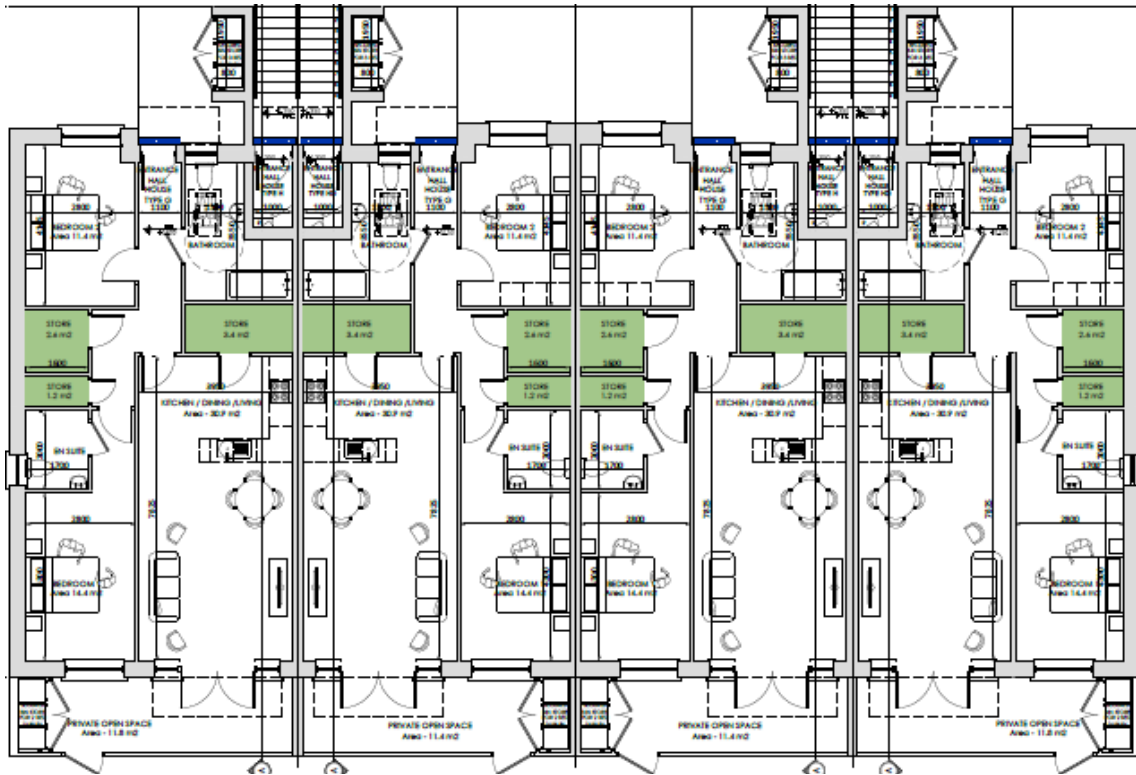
Proposed ground floor plan of Duplex Apartment Block J.
